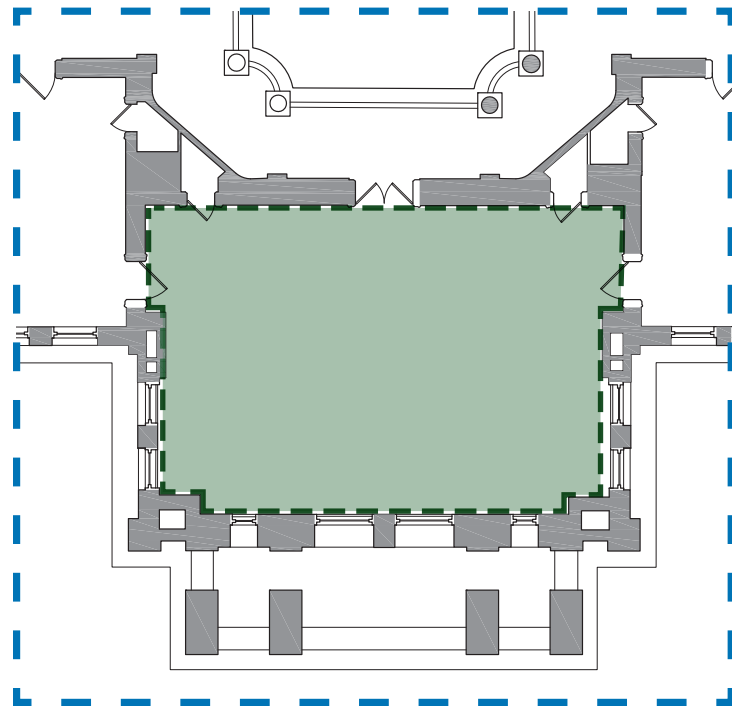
Second Floor Level Senate Chamber Support Space, South [Phase III - 1917].
